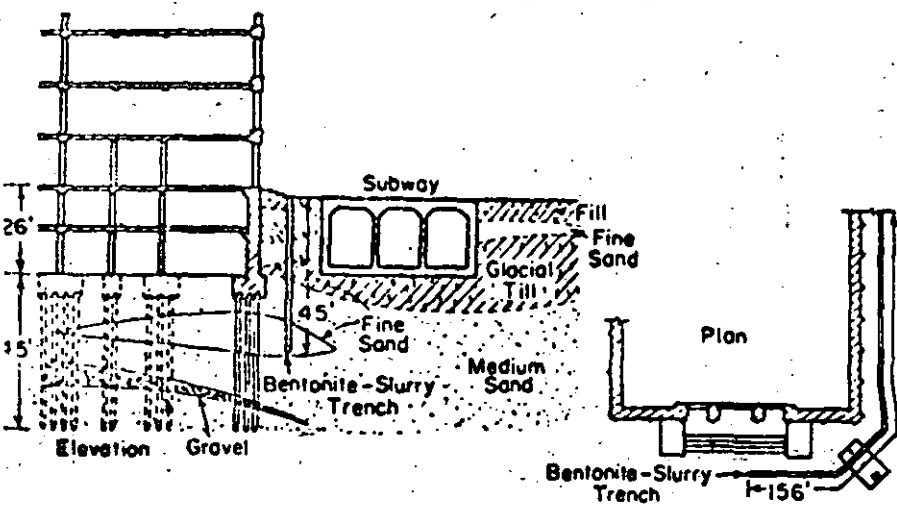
Building isolation using bentonite-slurry filled trench (after Neumeier, 1963).
